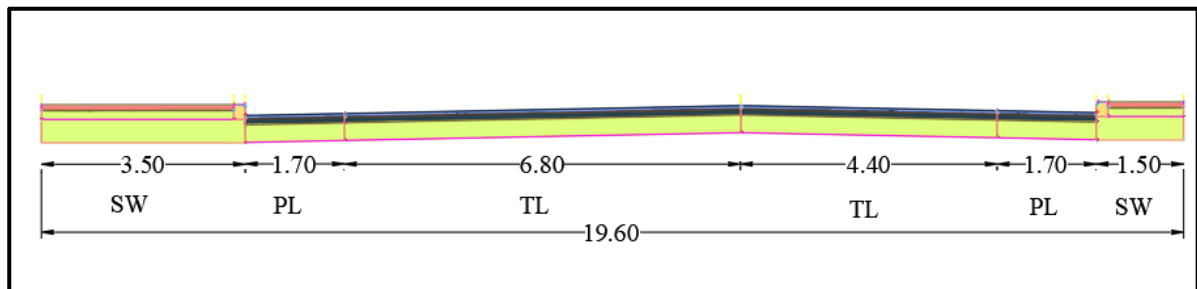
At Shamia Ice Cream Section No.1 Existing Cross Section
